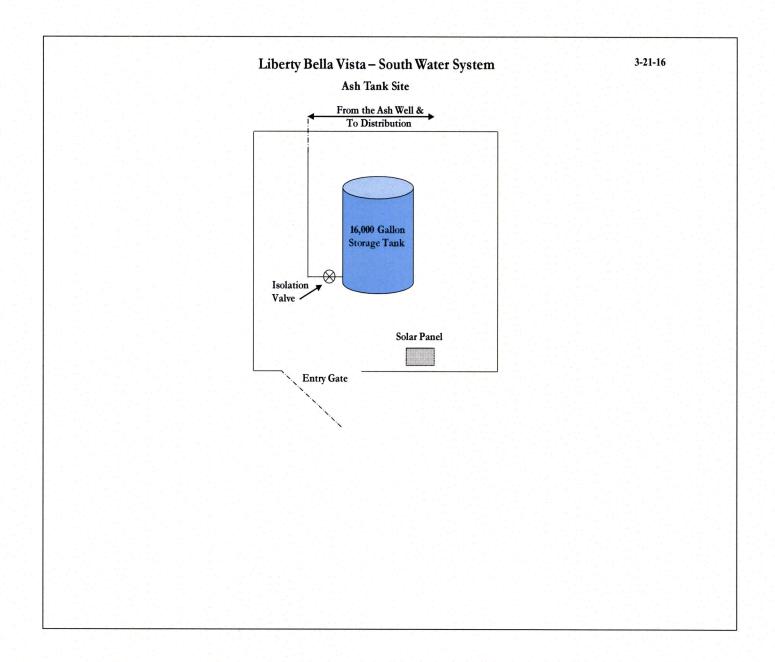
SOUTH WATER SYSTEM ASH TANK SITE
